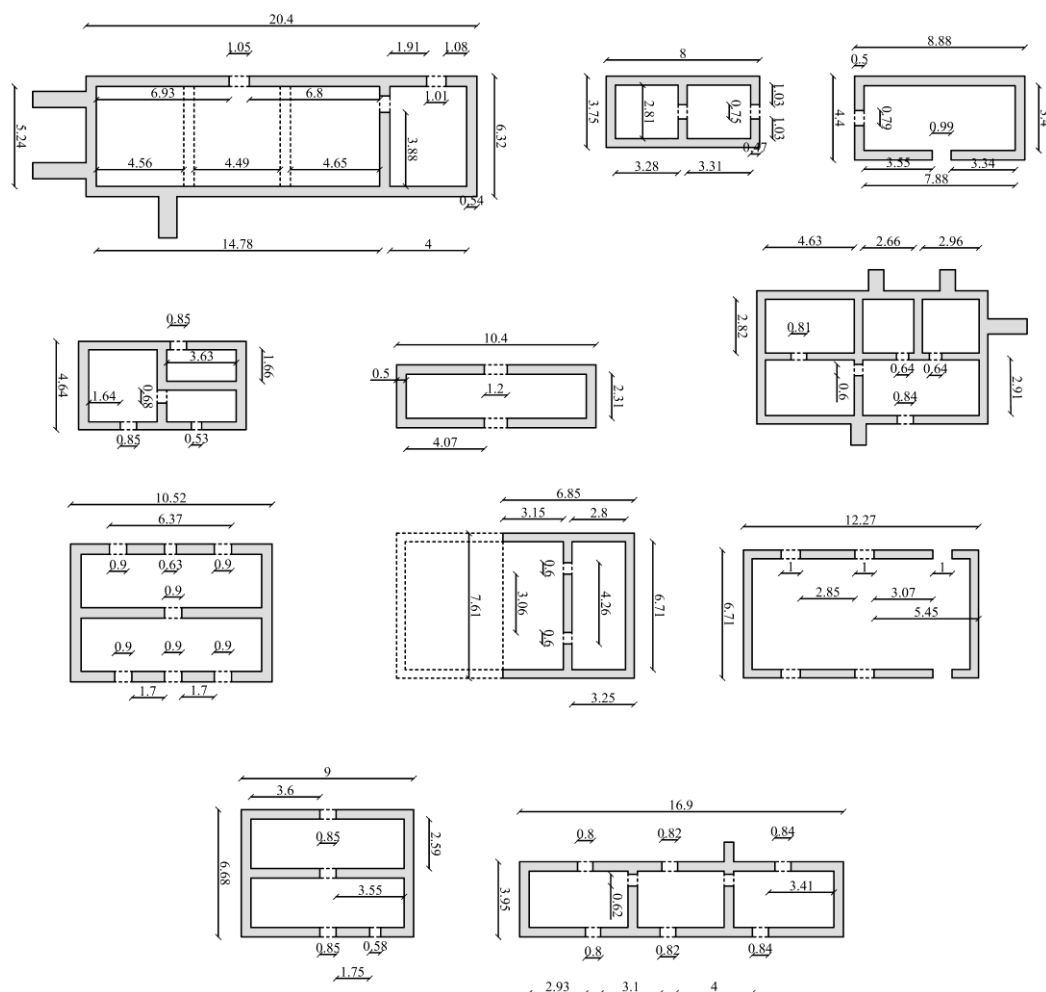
Plan view and dimension of surveyed rammed earth buildings (units in m) (adopted from Correia, 2007)
